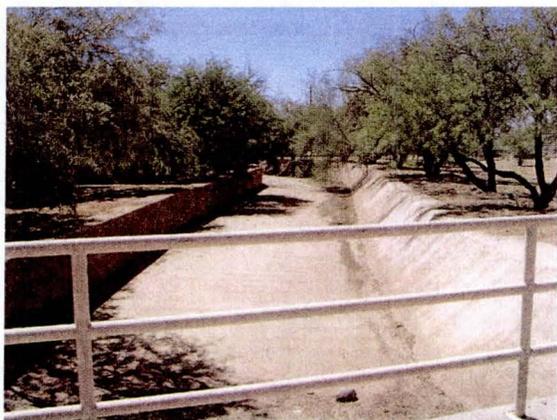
Existing culvert outlet @ Paradise Drive (facing south)
